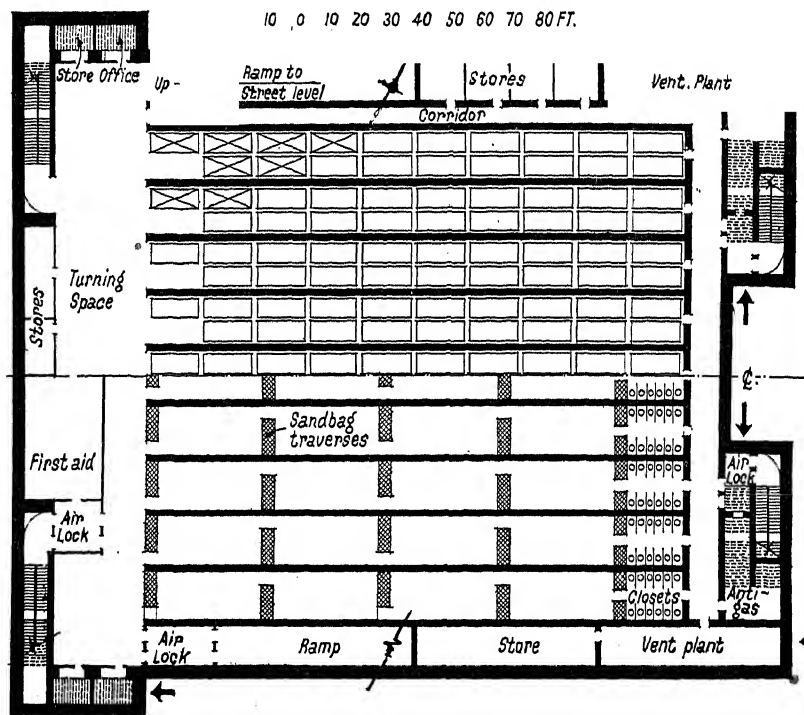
Typical plan of garage with mechanised parking—above centre line, arranged as a garage—below centre line arranged as a shelter.
